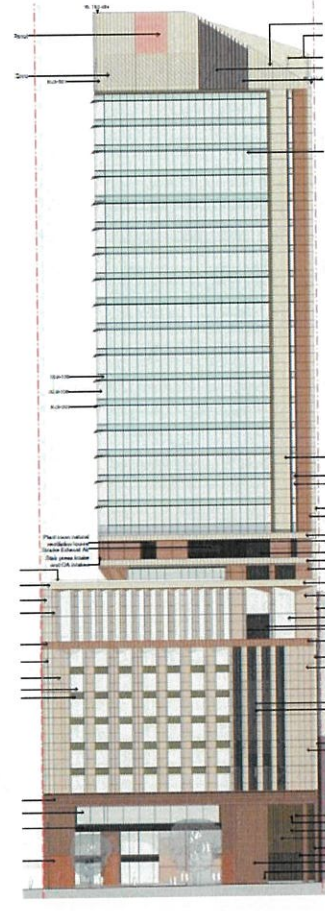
| West elevation (Castlereagh Street) (Source: Applicant's RtS)
